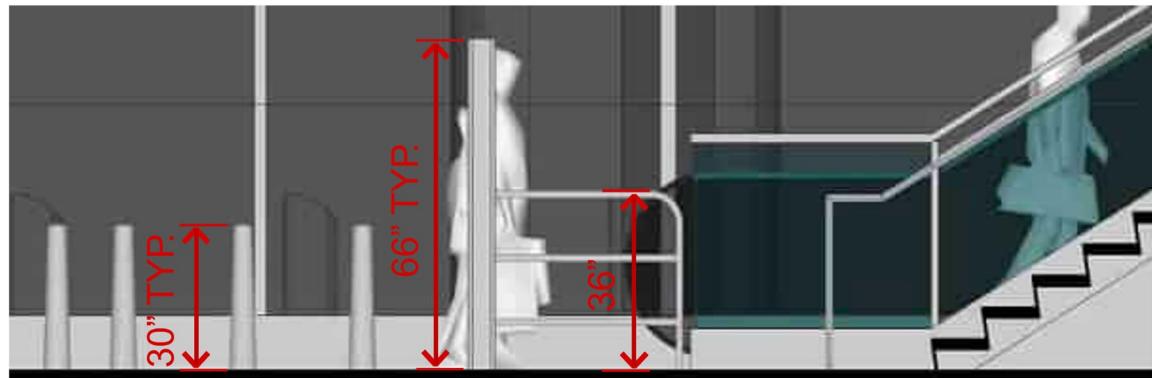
Terminal E, partial elevation at arrivals level 1, showing bollards and pylons with protection rails, adjacent to the entry point of the escalator.
